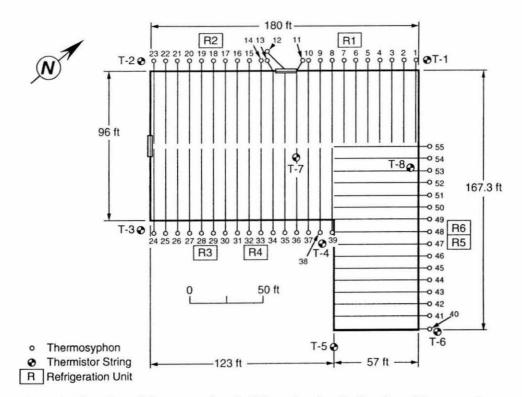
Plan view of the power plant building, showing the location of thermosyphons, thermistor strings, and refrigeration units.
